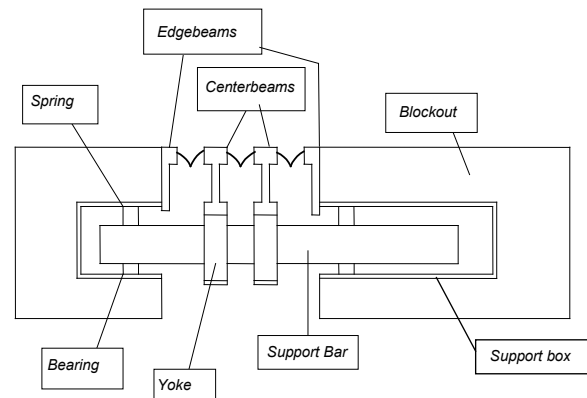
Cross-Section View of Typical Single-support-bar (SSB) Modular Bridge Joint System (MBJS) Showing Multiple Centerbeams with Yokes Sliding on a Single Support Bar
